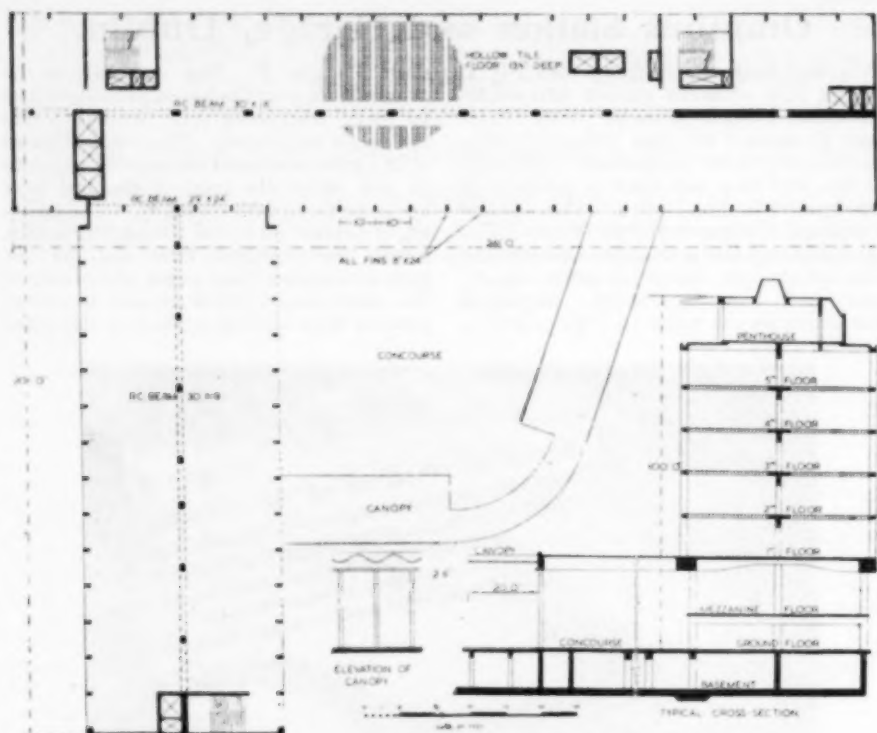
Plan of an Upper Floor and Sections of Omnibus Station.
